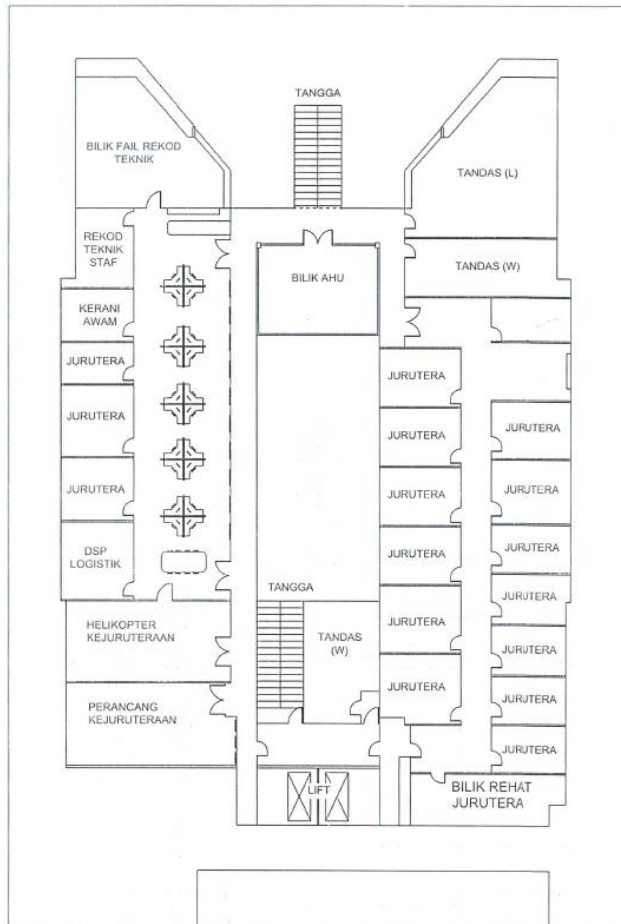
Facility Layout (GAM CAMO PGU Office)
